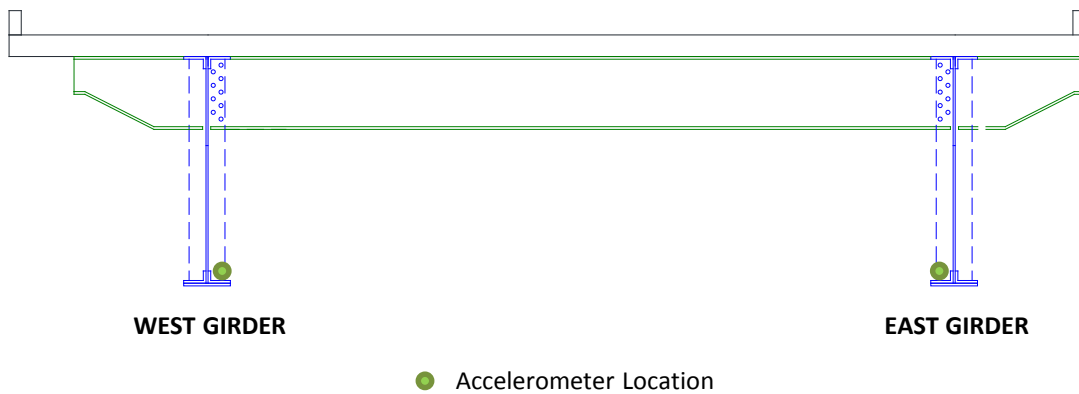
Cross-section view of the Medina River Bridge showing typical accelerometer locations on the bottom flanges of the longitudinal girders (brace sensors not shown).
